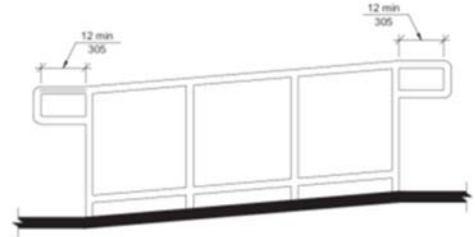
TOP AND BOTTOM HANDRAIL EXTENSIONS AT RAMP
